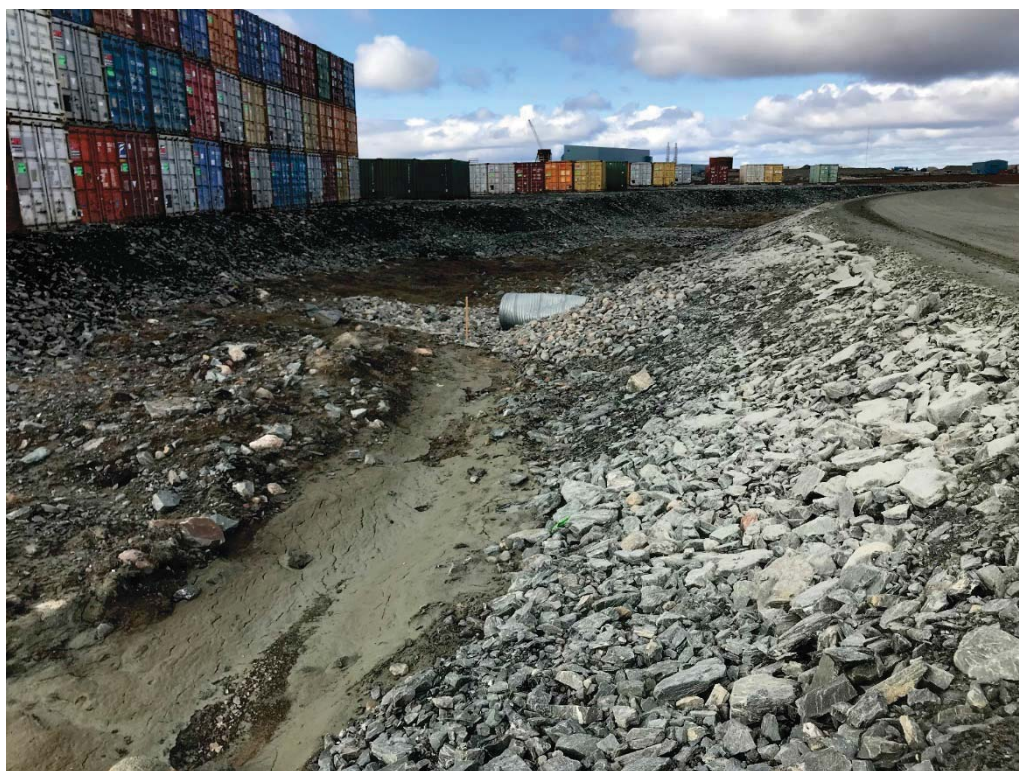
Culvert #2, Downstream Ends of Culverts, Looking Southeast. Temporary Culvert in background. Culvert #2 to be Extended and Will Connect with Channel #1 (12 September 2018)
